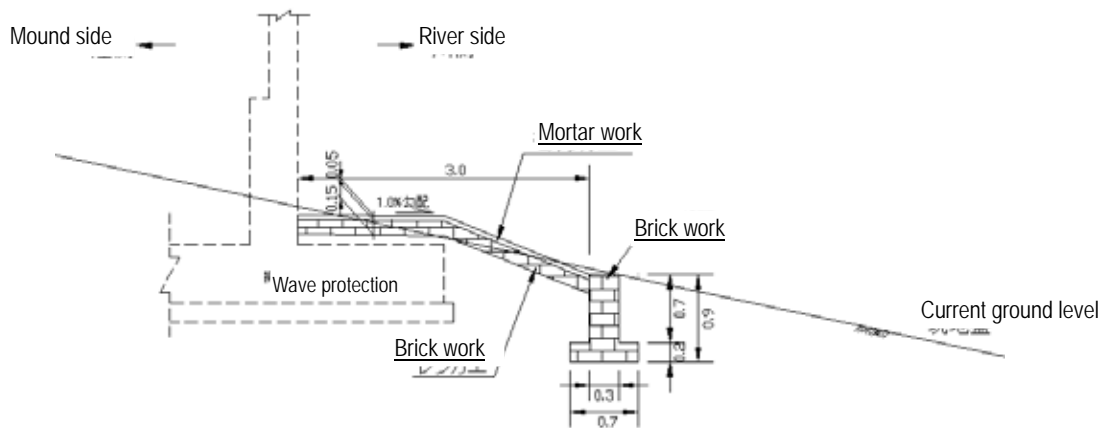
Standard cross-sectional drawing of configuration of foot protection
